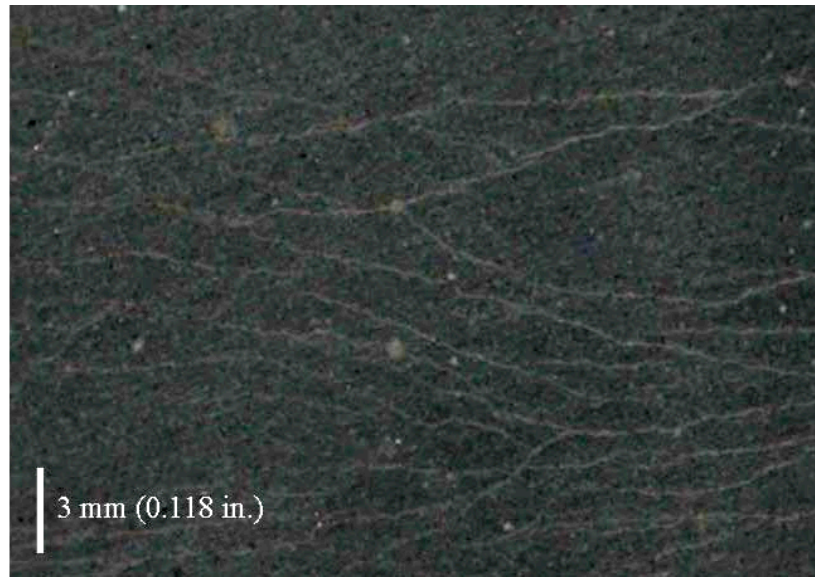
Typical crack pattern on positive moment surface of ECC beams at 2 mm (0.079 in.) deformation.
